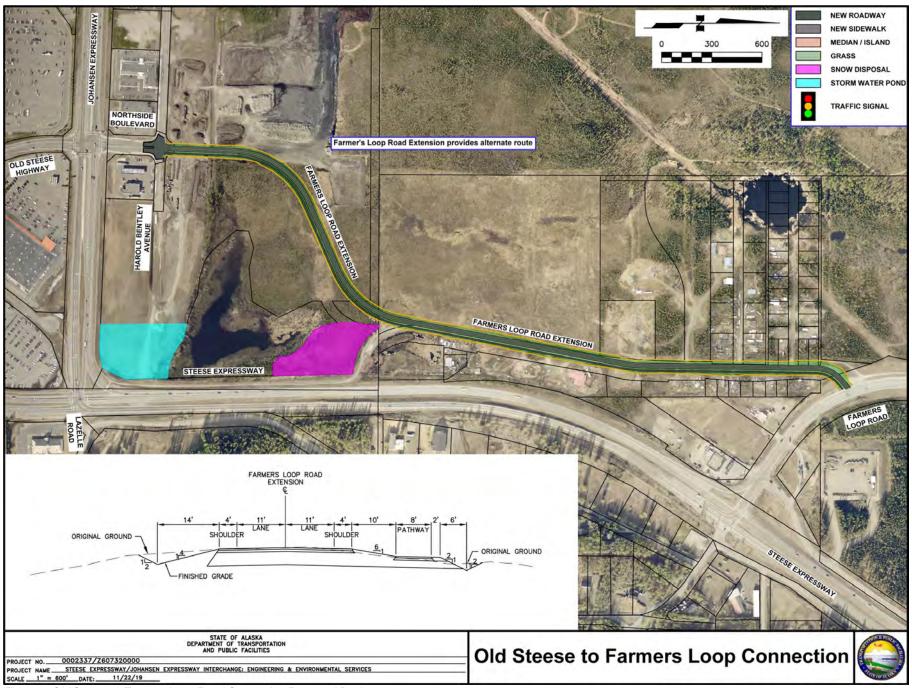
Old Steese to Farmers Loop Road Connection Proposed Design
